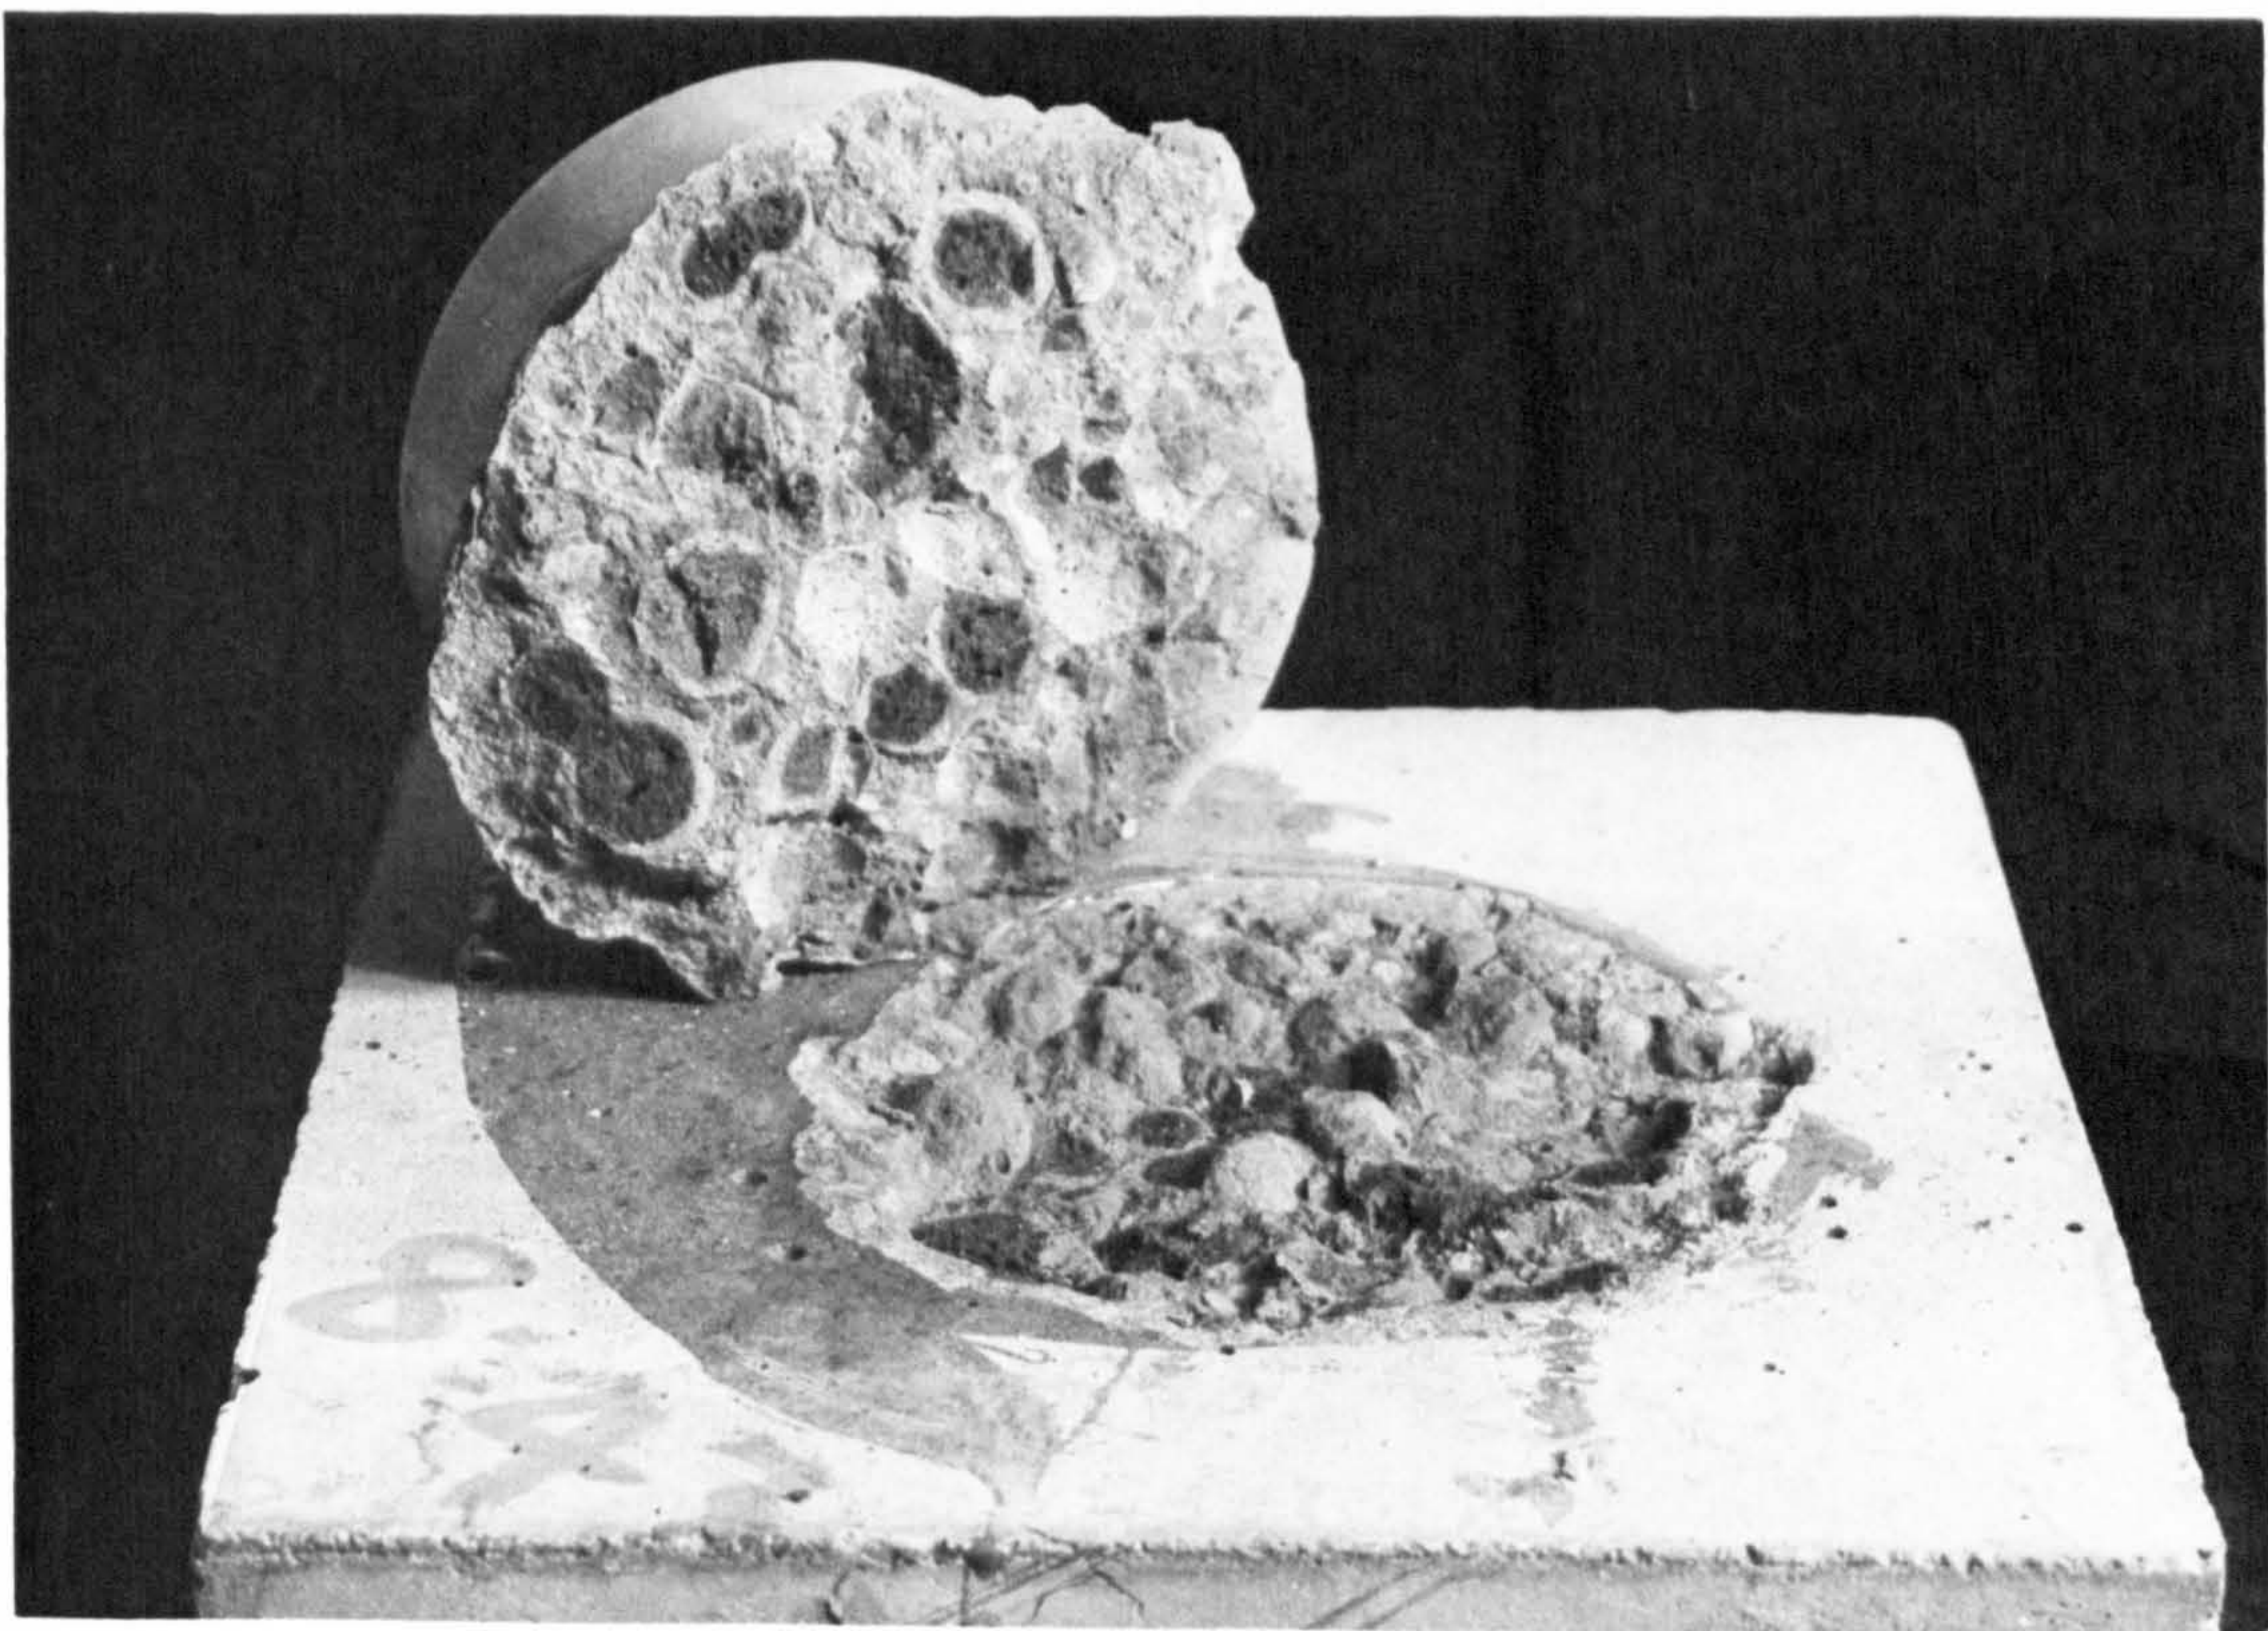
Typical failure from surface pull off test on semi Lytag concrete with high strength
